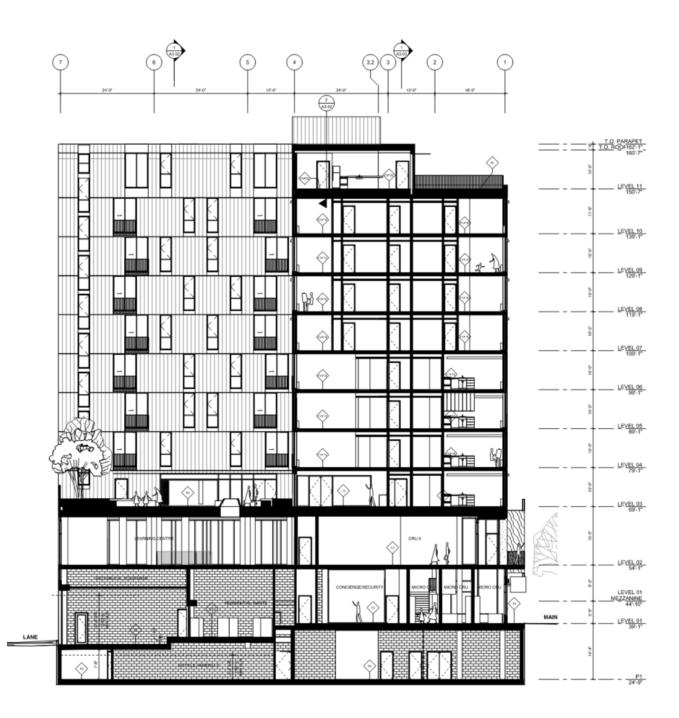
Section for 11-storey MAC building, Vancouver, Canada
